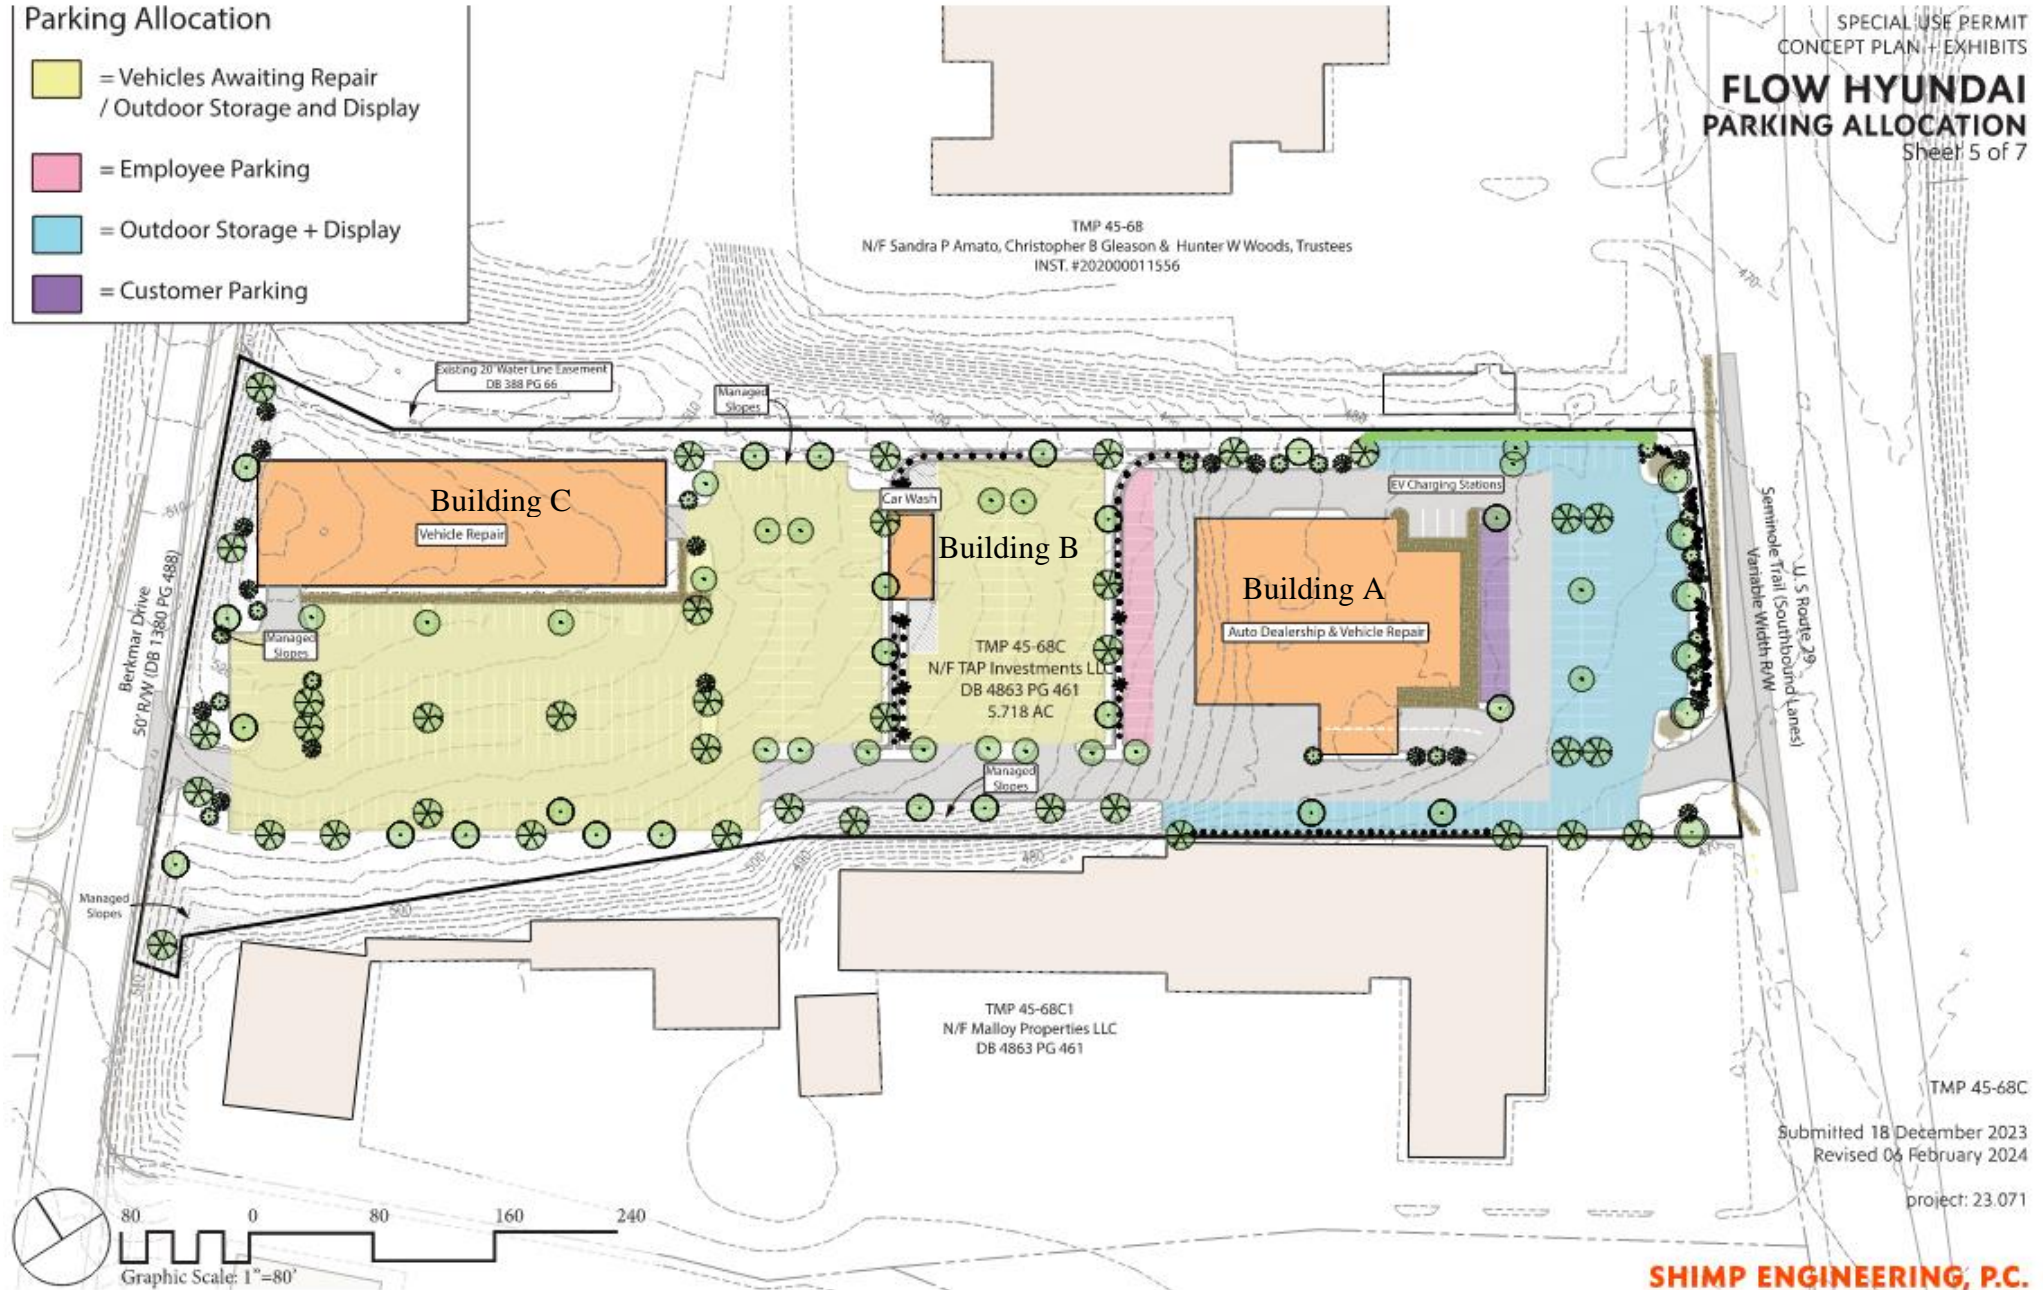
Proposed concept plan showing the layout of buildings, travelways, vehicle storage and display areas, and parking.
